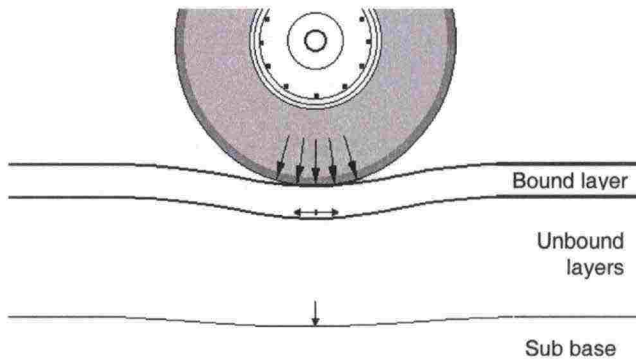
Tensile strain at the bottom of pavement caused by wheel load.
